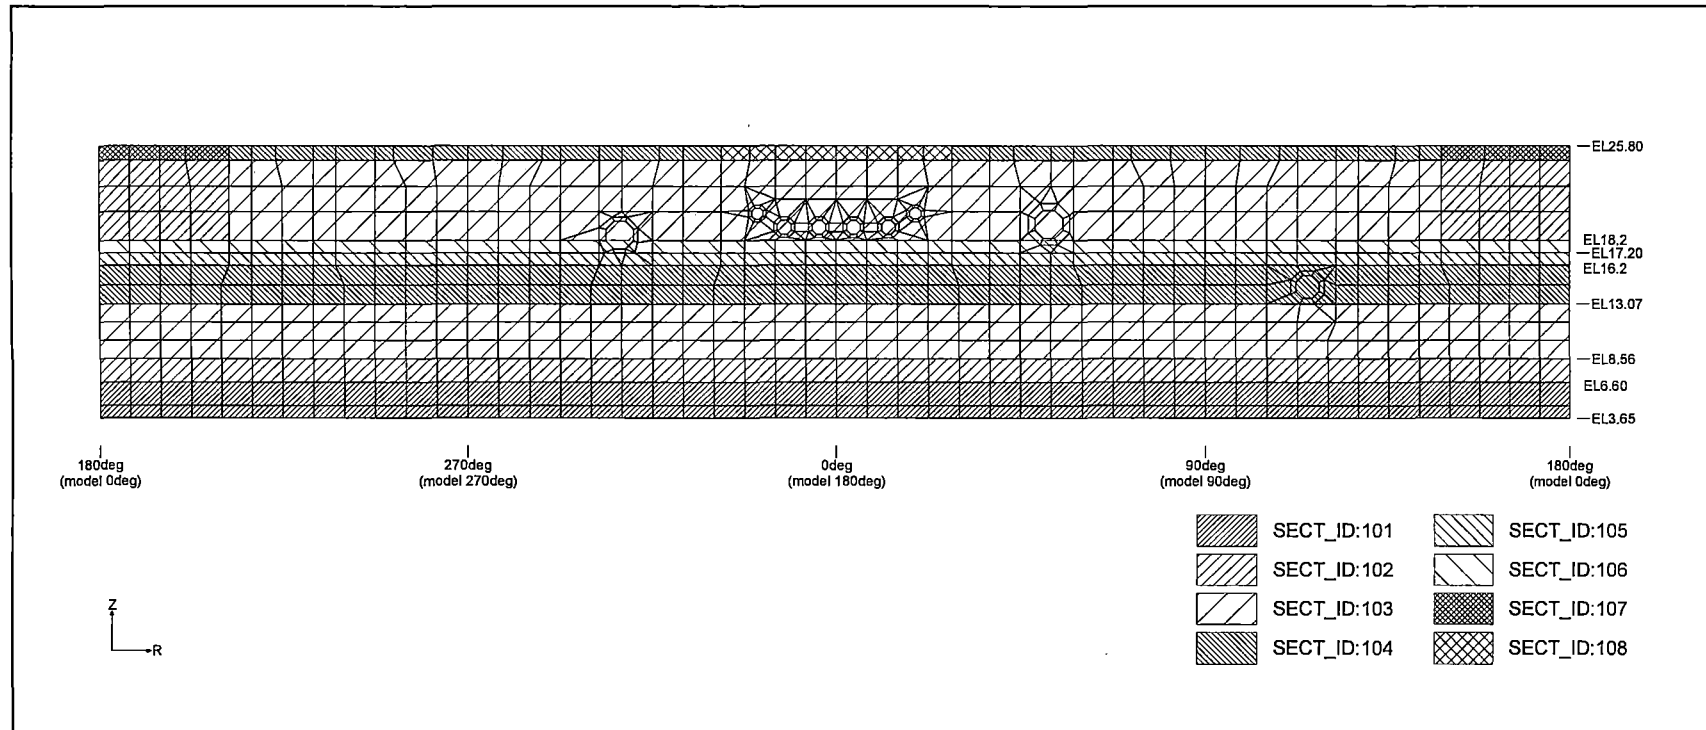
Reinforcement Provided in Elements (RCCV Cylindrical Wall)
